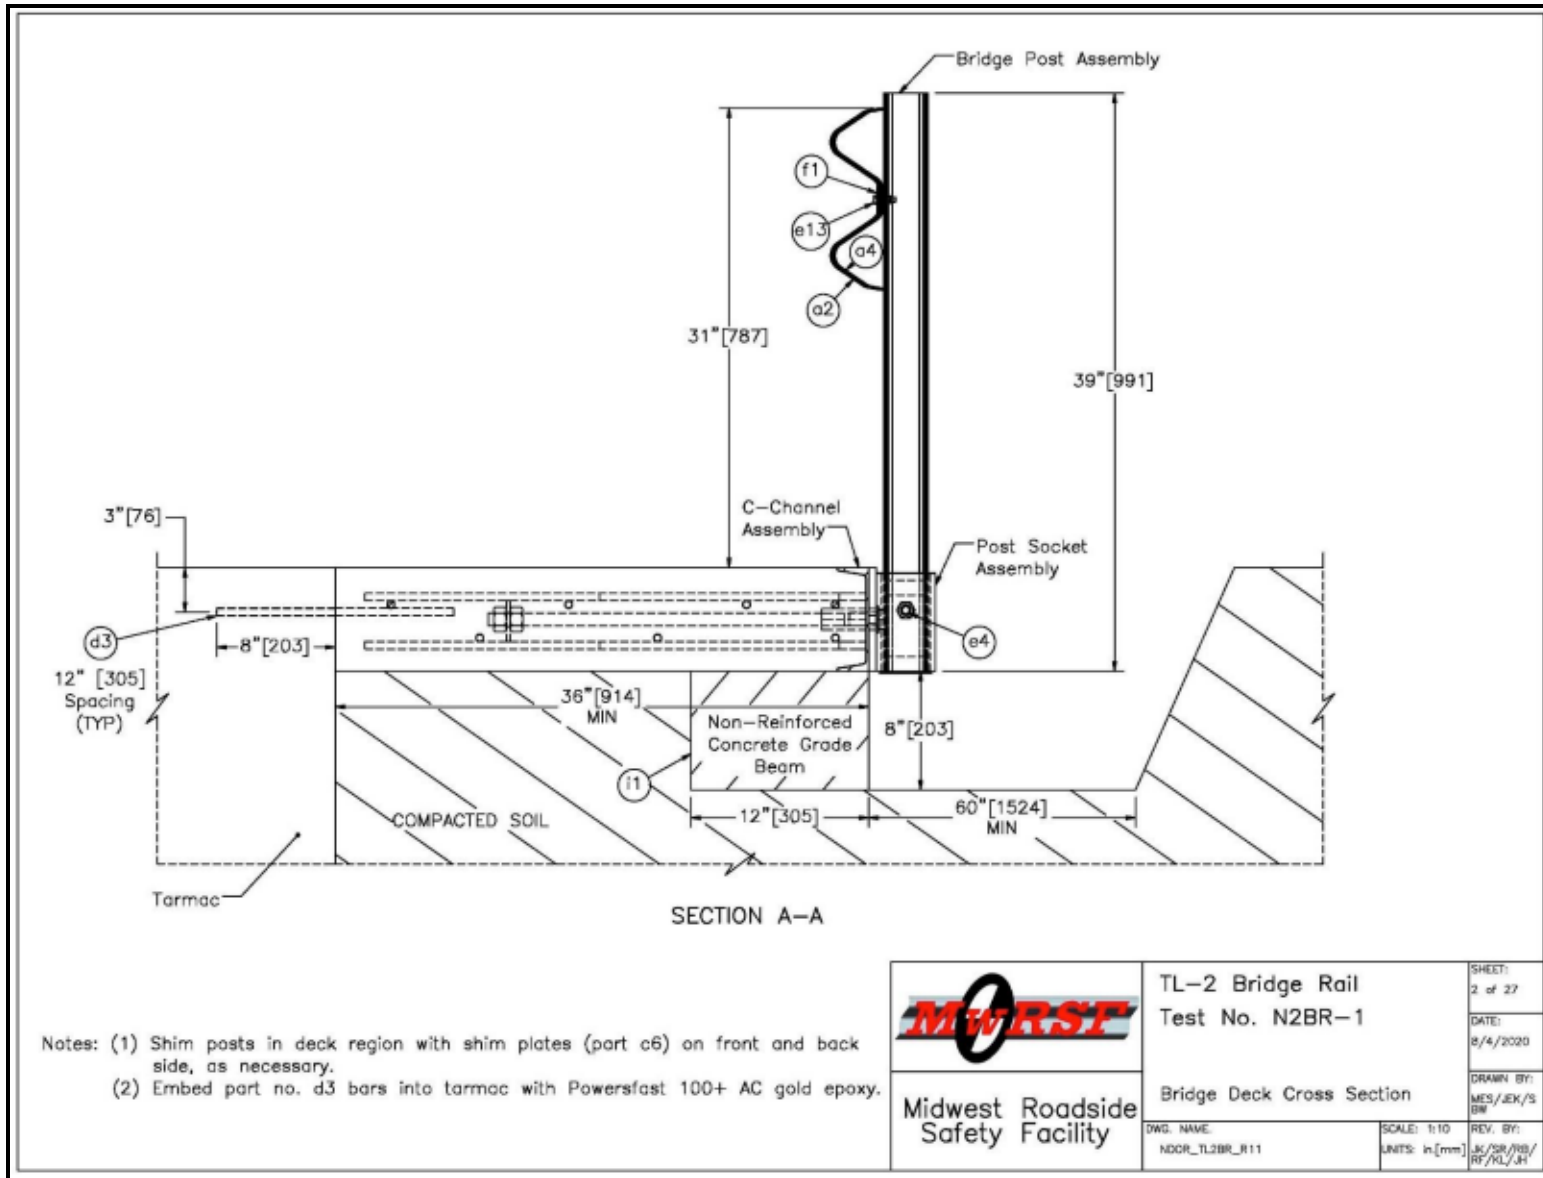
Cross Section View of NDOR TL-2 Bridge Rail [10]
